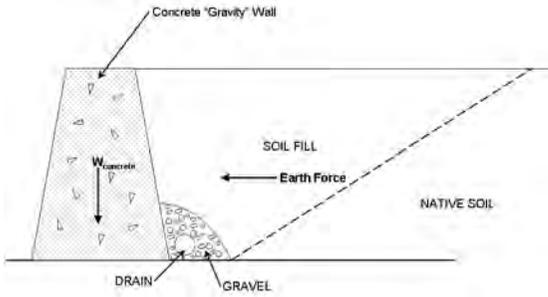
Concrete Wall Weight Resists Overturning Earth Pressure
